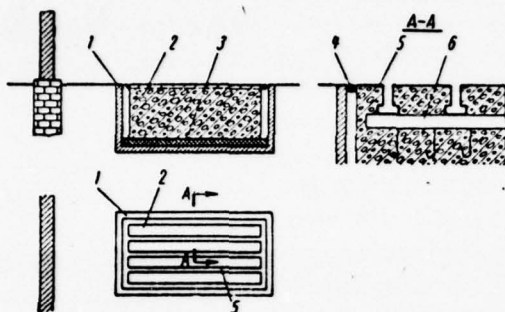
The diagram of foundation under the stand, isolate/insulated from the surrounding constructions of building on the cushion: 1 - duct of foundation; 2 - foundation; 3 - cushion; 4 - elastic packing/seal; 5 - busbar/tire for fastening of bench equipment; 6 - stressed frame.
